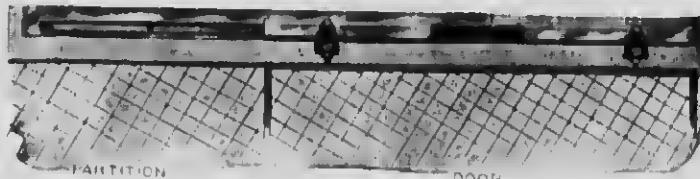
SHOWING SINGLE DOOR CLOSED.
